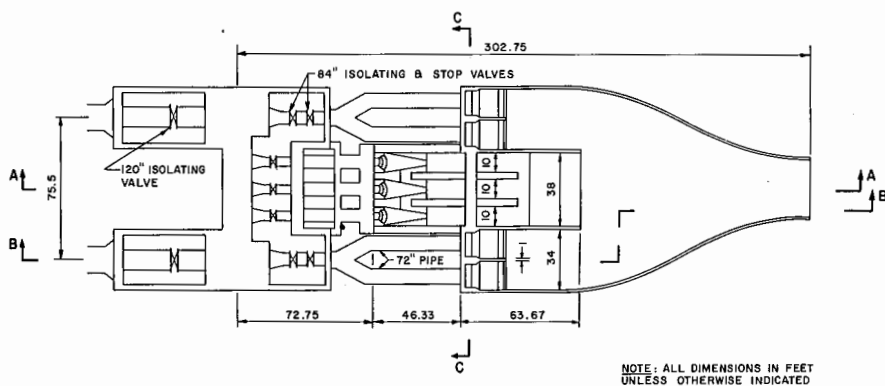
A — The Warragamba Pipelines Stilling Basin - Plan
